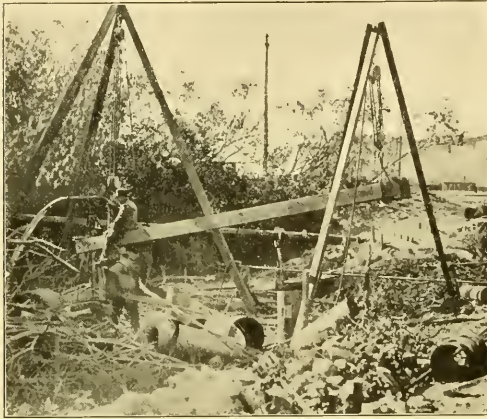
RIG USED FOR DRILLING NO. 6 WELL
